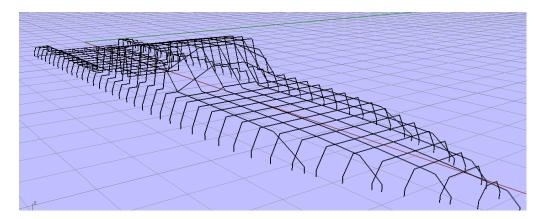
, longitudinal and transverse section frames lines with outside offset of
